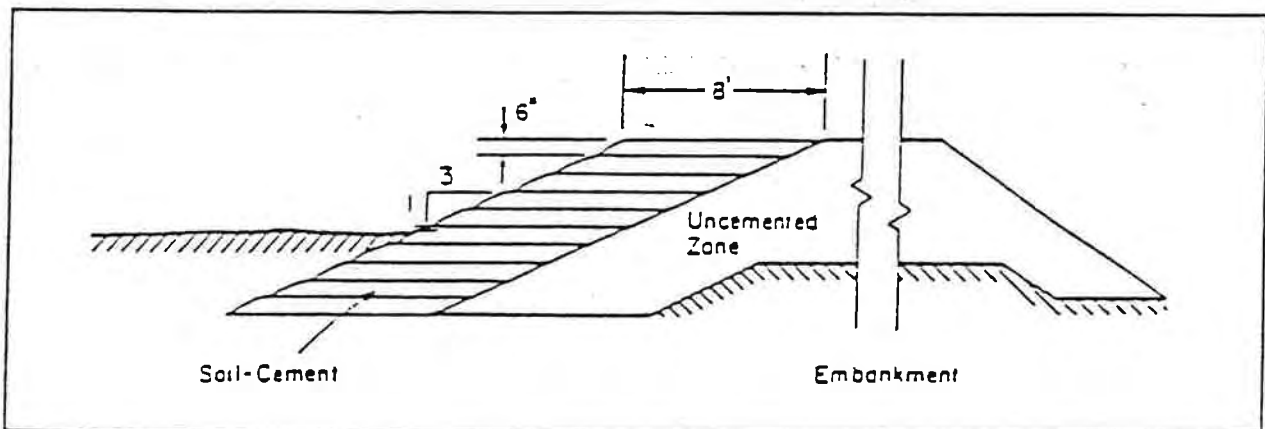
Typical soil-cement bank protection (after Richardson et al., 1990)
